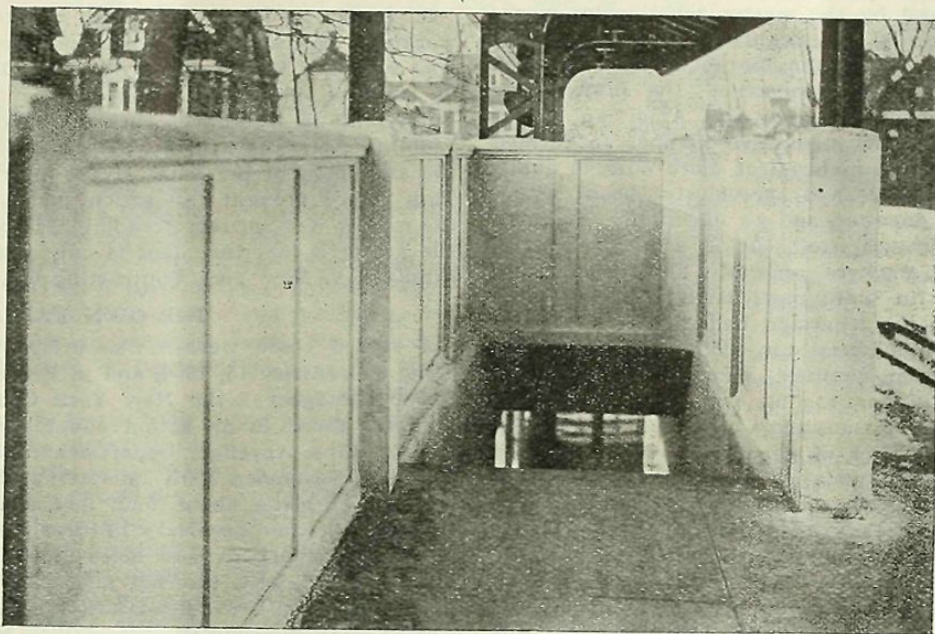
ENTRANCE TO AVENUE H STATION, BRIGHTON BEACH ROAD OF THE B. R. T.
